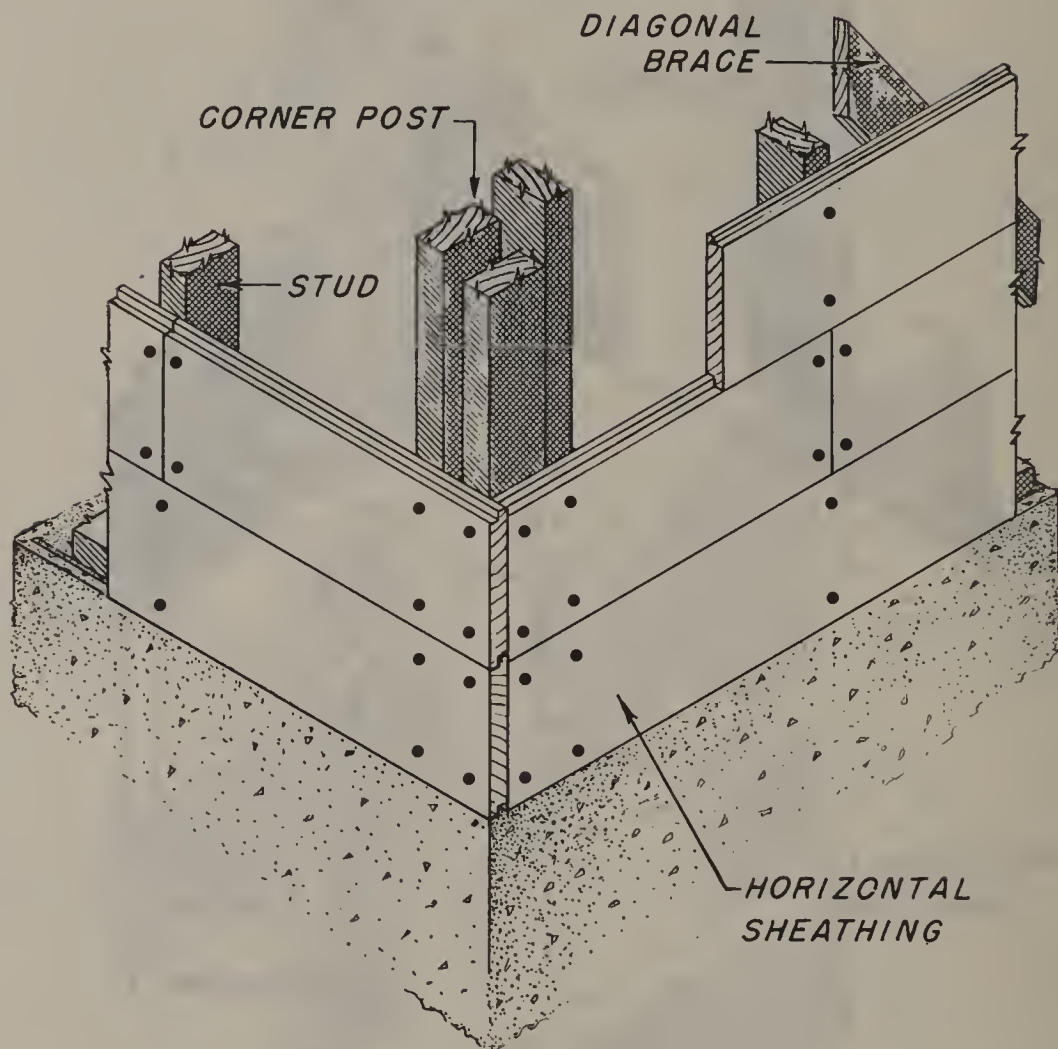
Horizontal wall sheathing. Boards 8 inches or less in width nailed to framing members with one eightpenny nail near each edge of the board. Wider boards nailed with three eightpenny nails, one near each edge and one near the middle of the width. Note: It is desirable that sheathing be of such widths and so placed that junctions between sill and joist and between joist and studs are each spanned by the nails in a single board. This ties other framing members to the sill, although less effectively than diagonal sheathing (fig. 32) or plywood (fig. 34).
